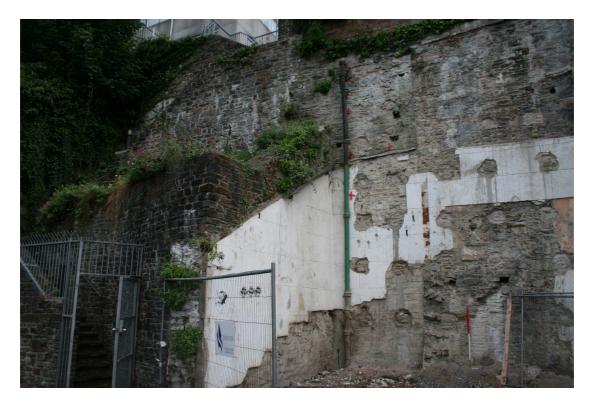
Southwest corner of retaining wall with gated entrance to steps up to Carmarthenshire County Council Offices visible in bottom left hand corner.
